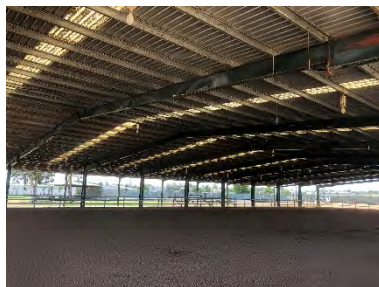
evidence of steel corrosion to steel beams – this may be due to the watering of the surface.
